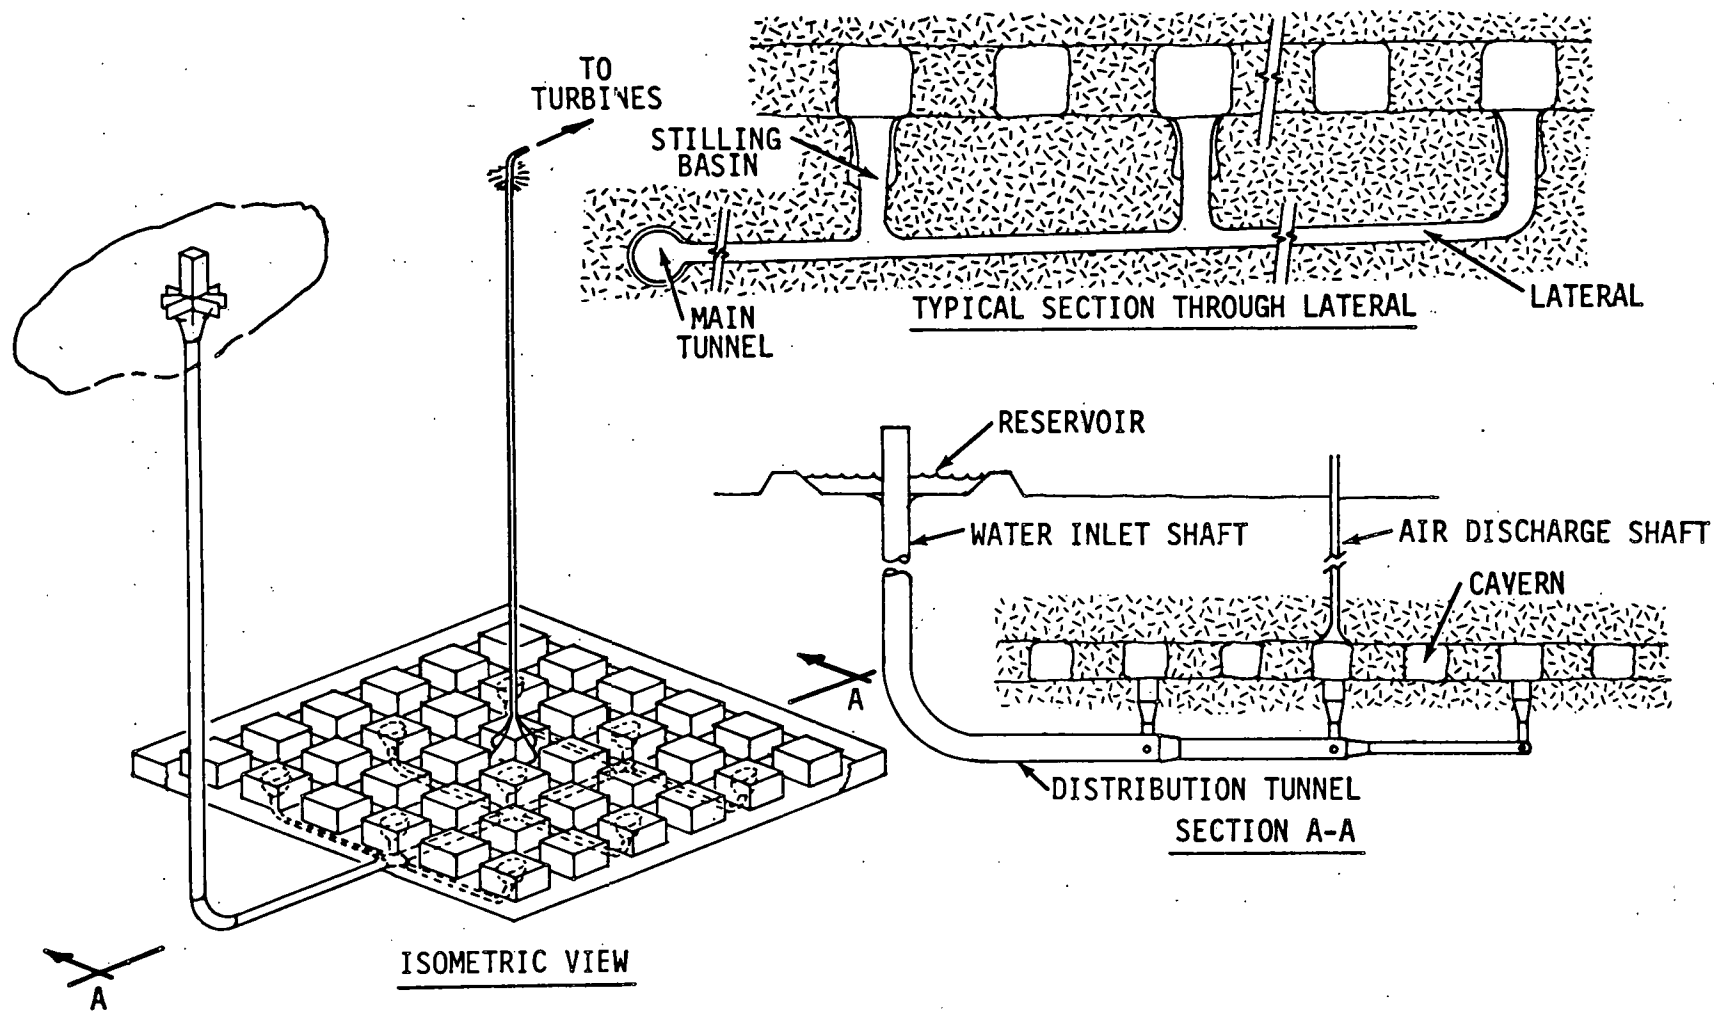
Conceptual Design of Room and Pillar Compressed Air Storage Cavern
